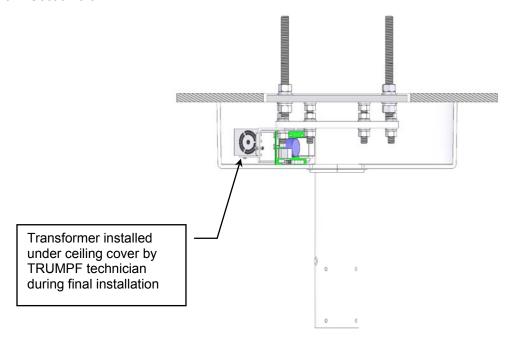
Transformer Installed Underneath Light Ceiling Cover
